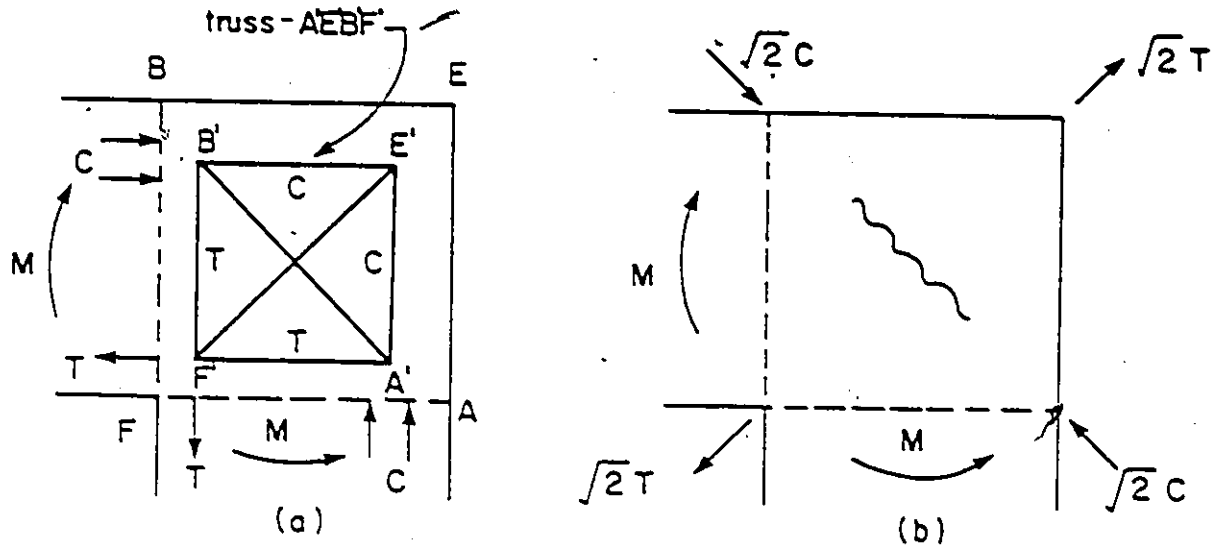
DIAGONAL TENSION CRACK FAILURE
